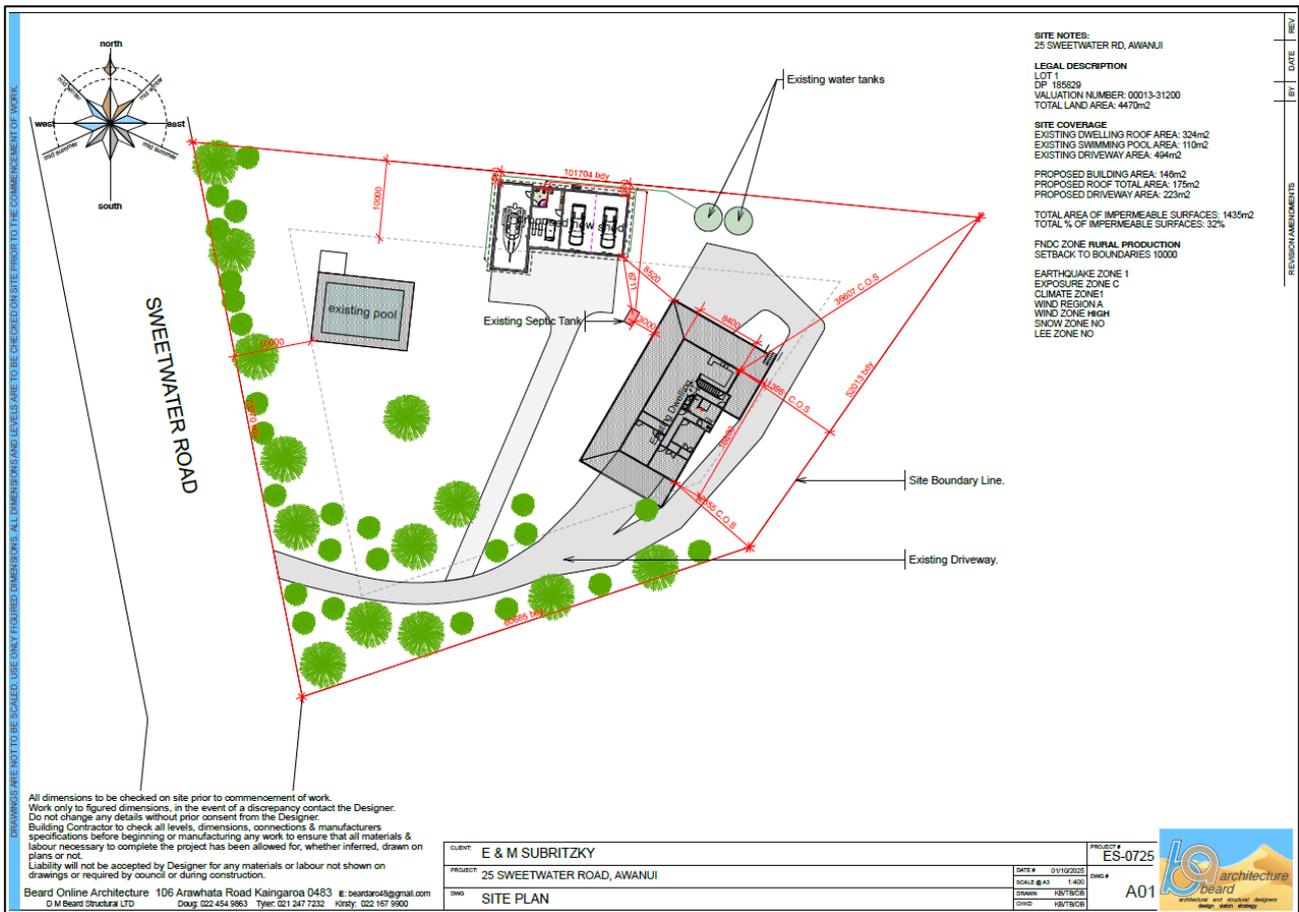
Snip of site plan by Beard Architecture (Ref No: ES-0725, dated: 01.10.2025)
